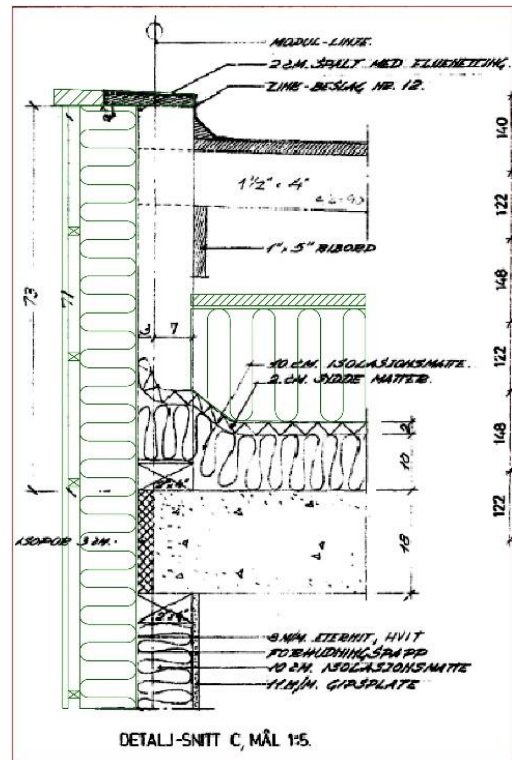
Detail roof/face after the renovation. The green indicate the new layers/components.
